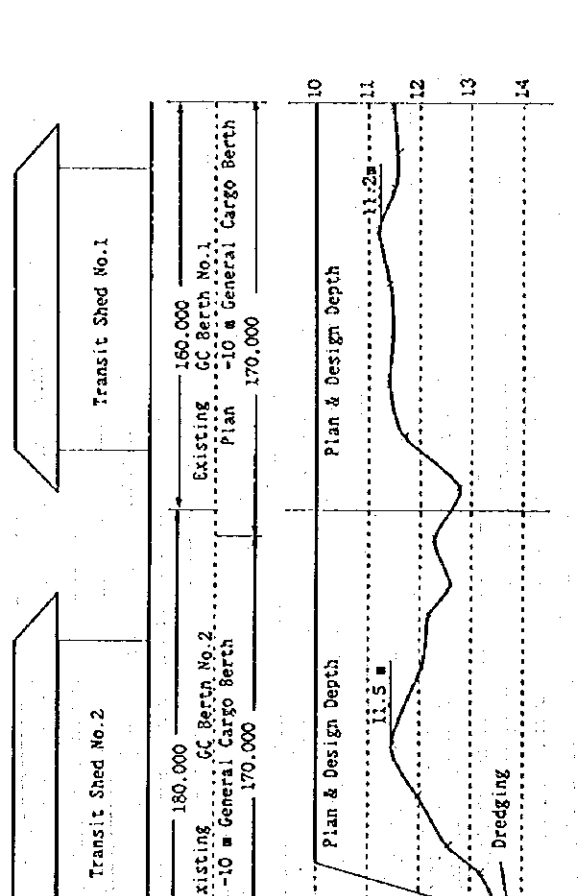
(1) Water Depth and Dredging Plan (Alternative 2)
